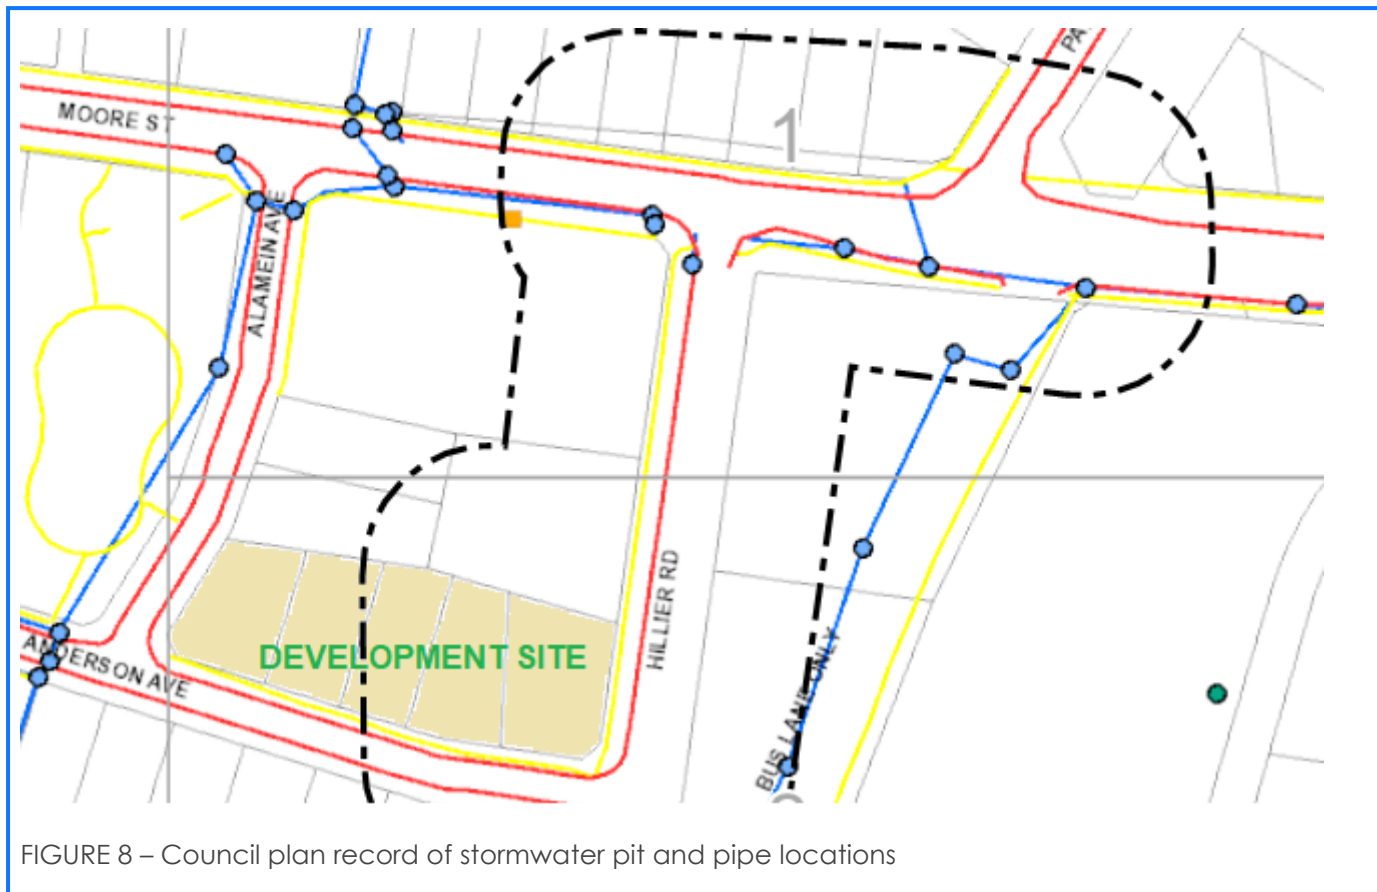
Council plan record of stormwater pit and pipe locations
